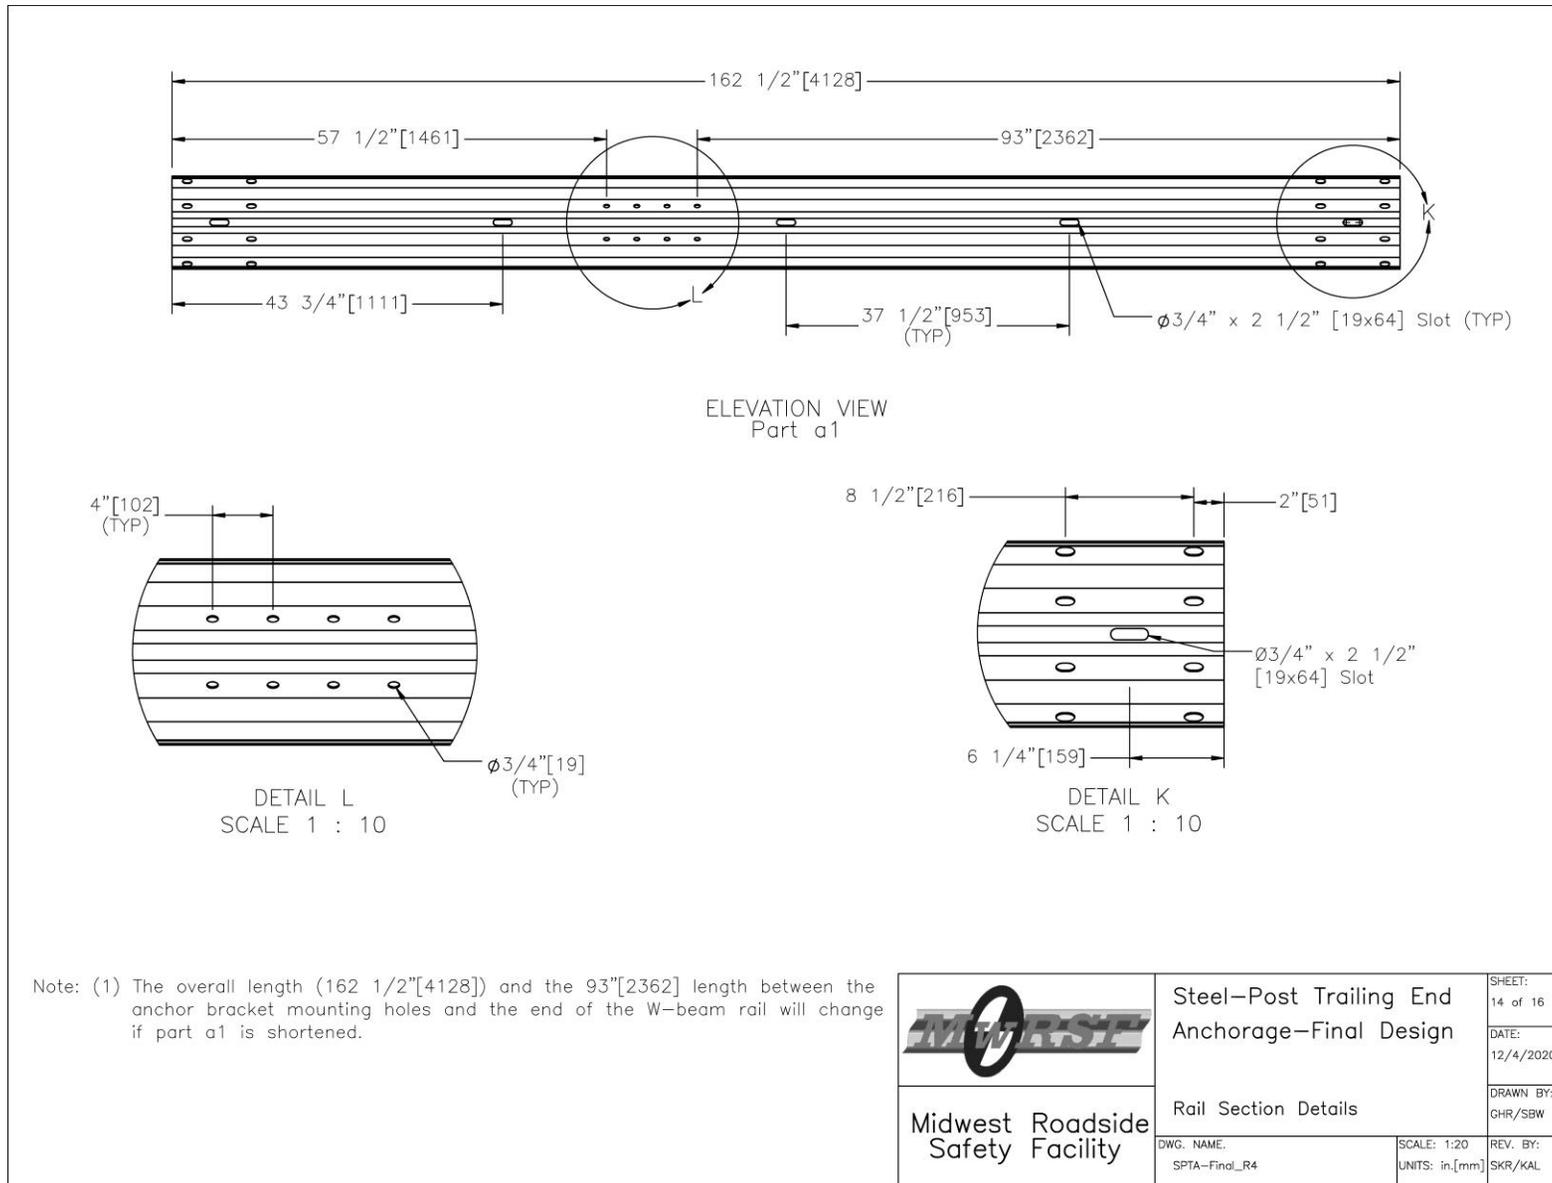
Steel-Post Trailing End Anchorage, Rail Section Details
